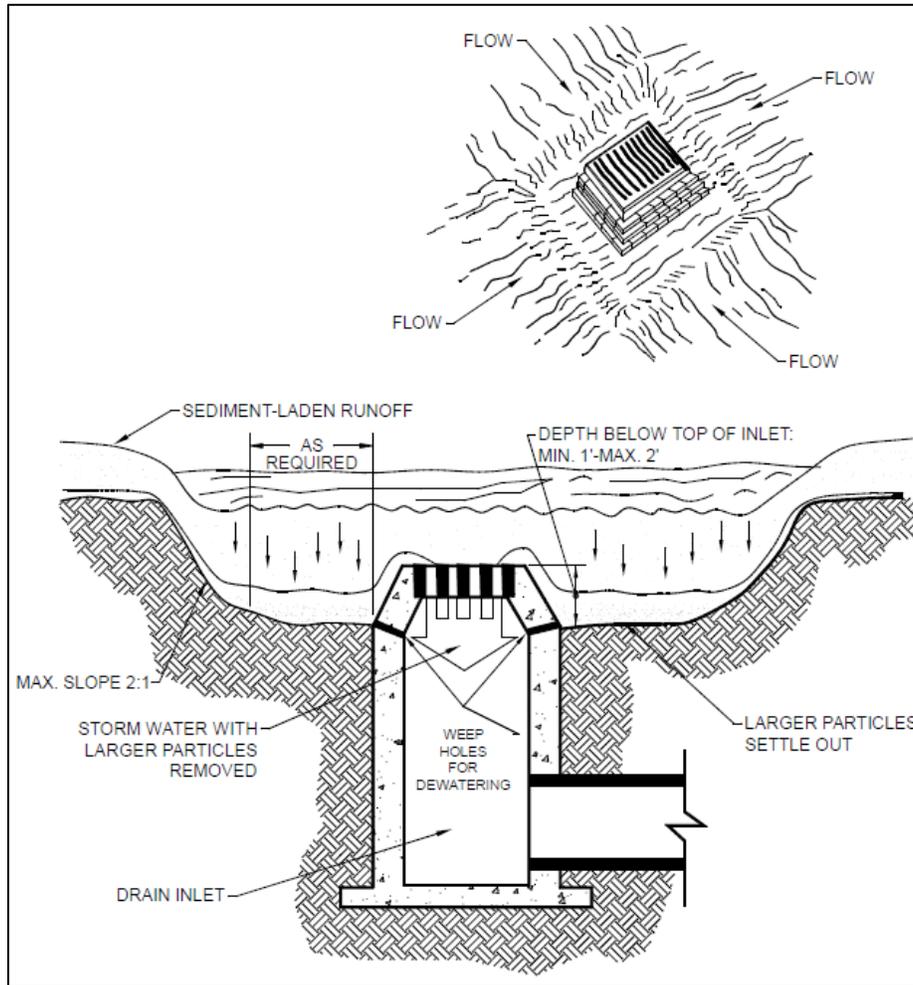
A: Excavated drop inlet protection details. Adapted from VDEQ (2024).
